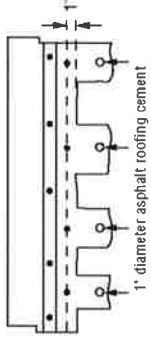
Fastening Presidential and Presidential TL Shake shingles on steep slopes.
